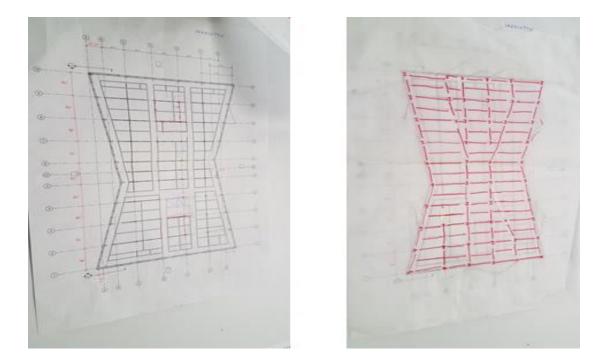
Mezzanine framing plan (right image) partially supported by the post and wall (left image).
